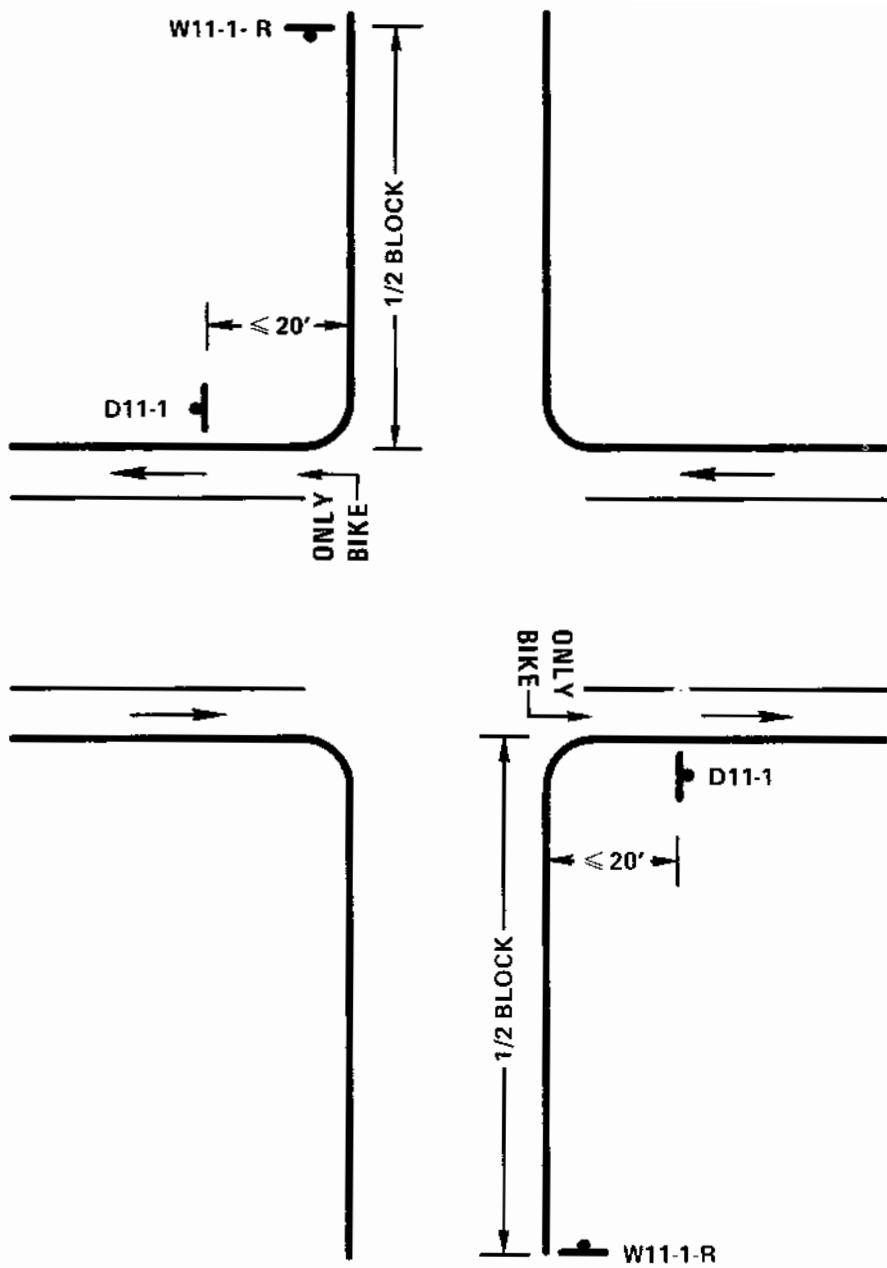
Intersection Signing Plan: Class II Bikeway Crossing a Non-Bikeway Street
